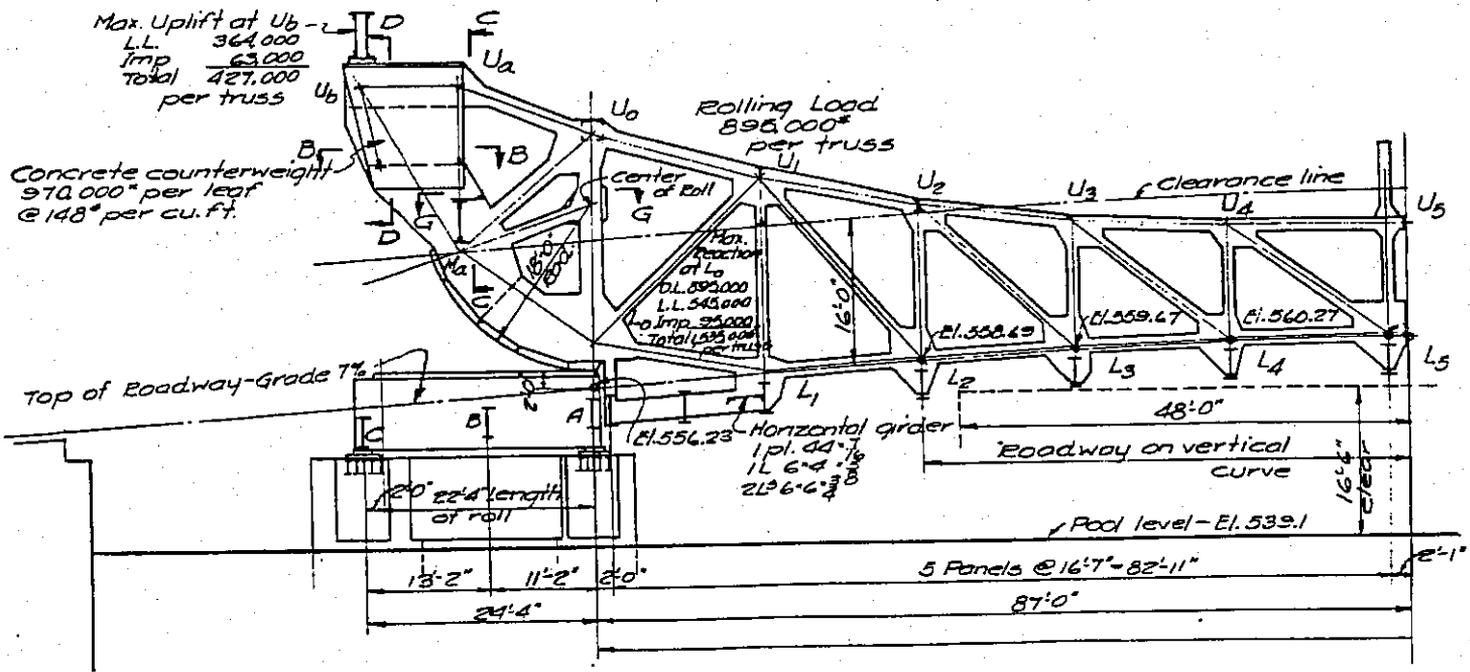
Sectional view of the Cass St. Bridge rolling lift bridge, showing counterweight, tracks, tread and 1/2 span. Adapted from original 1931 plans.
